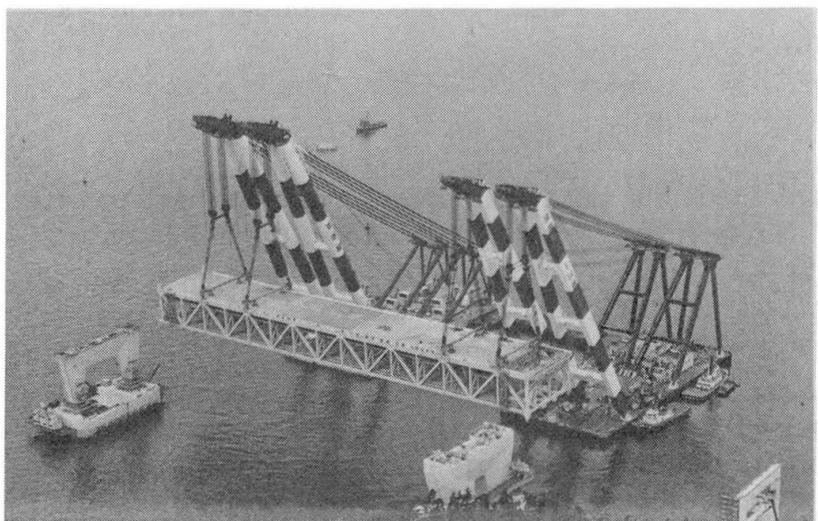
Large block erection: side span of the Iwakuro Island Bridge (courtesy of the Honshu-Shikoku Bridge Authority)
